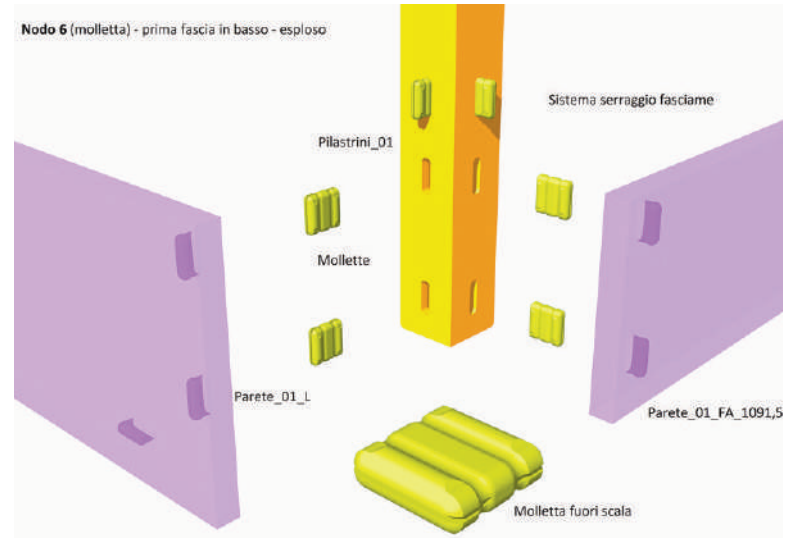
Exploded perspective view of some coupling points by means of the Peg component.
